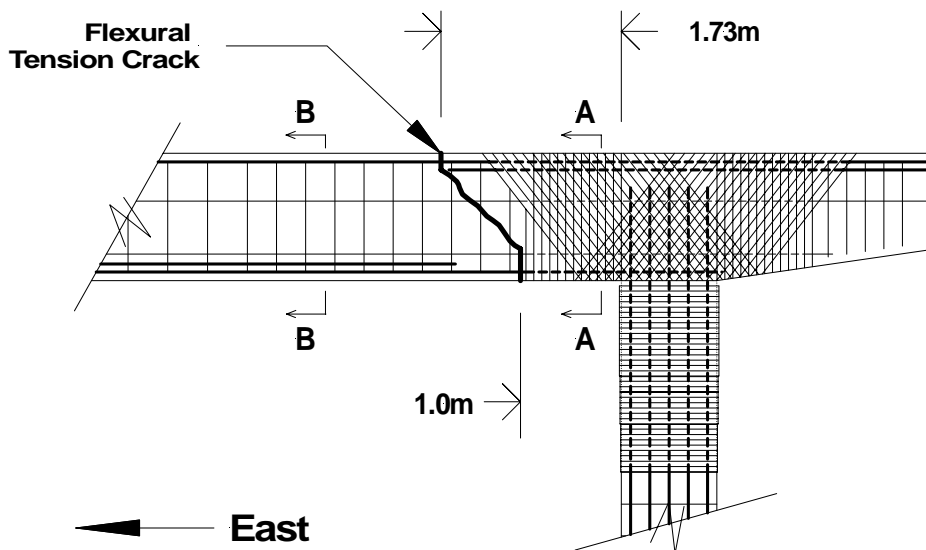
Tension crack relative to the negative moment longitudinal reinforcement steel and the CFRP confinement adjacent to the West column
